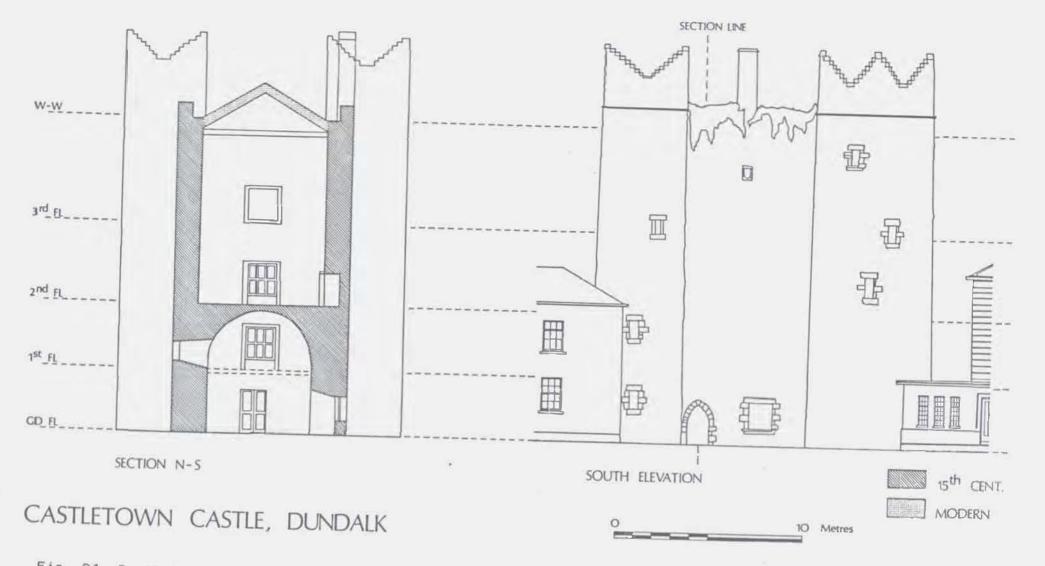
Castletown Dundalk: Castle, section north-south and south elevation.
